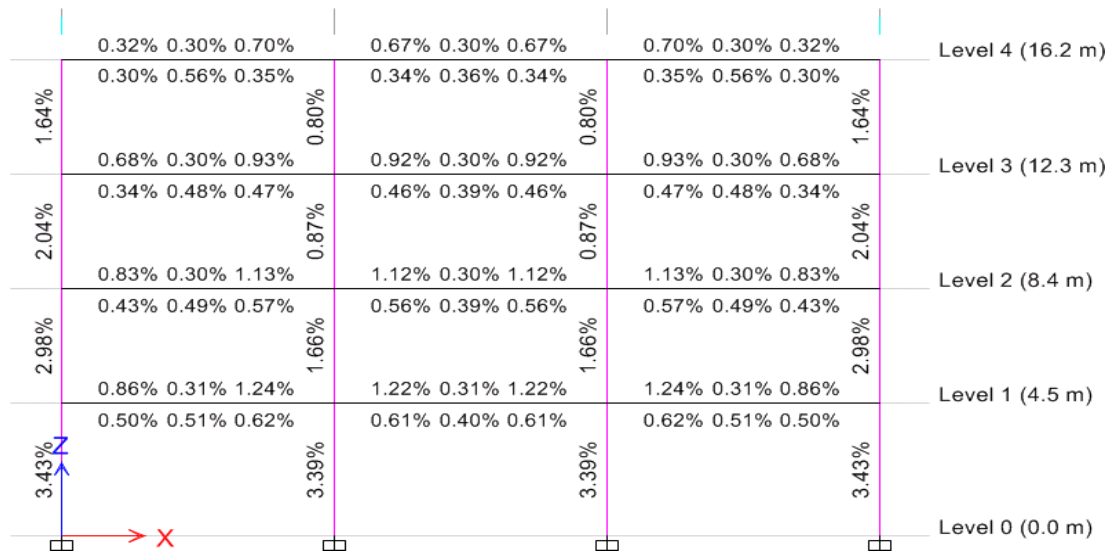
Required longitudinal reinforcement for building ID 2221
